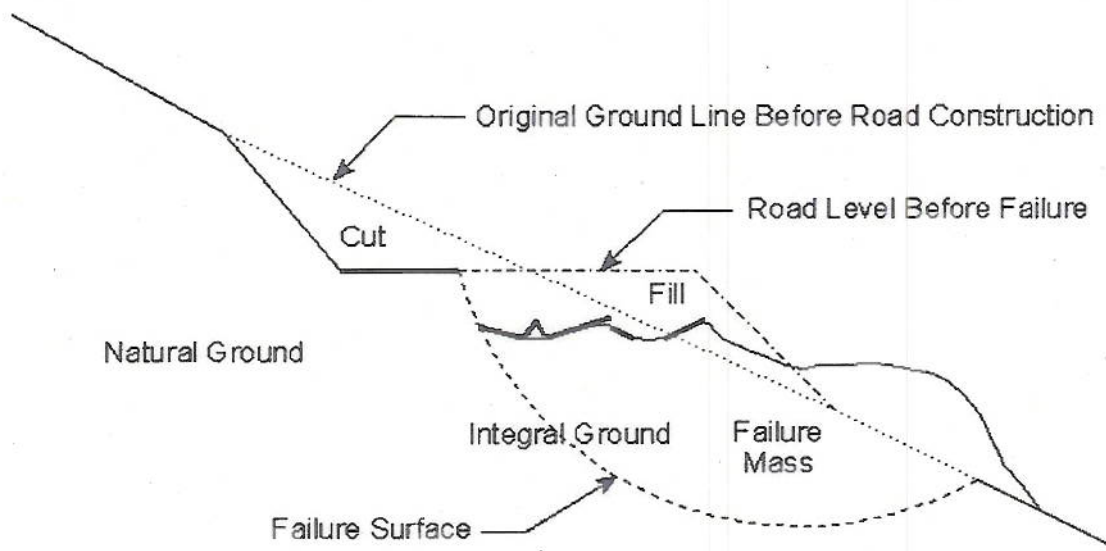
Slope failure in a typical cut-and-fill road section. Restoration of integral ground is a necessary component of work required to repair the road, and would involve excavation slightly beyond the limits of the failure surface.
